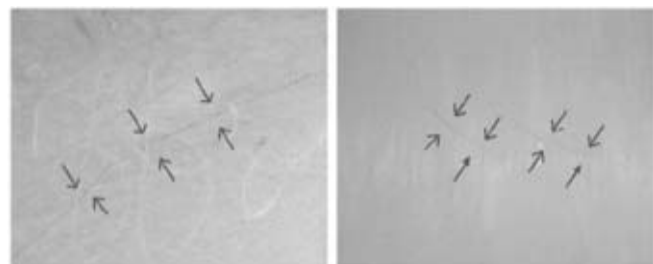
View of the cosmetic damage at first floor of the RCC structure at Sonepur Bazari mine
